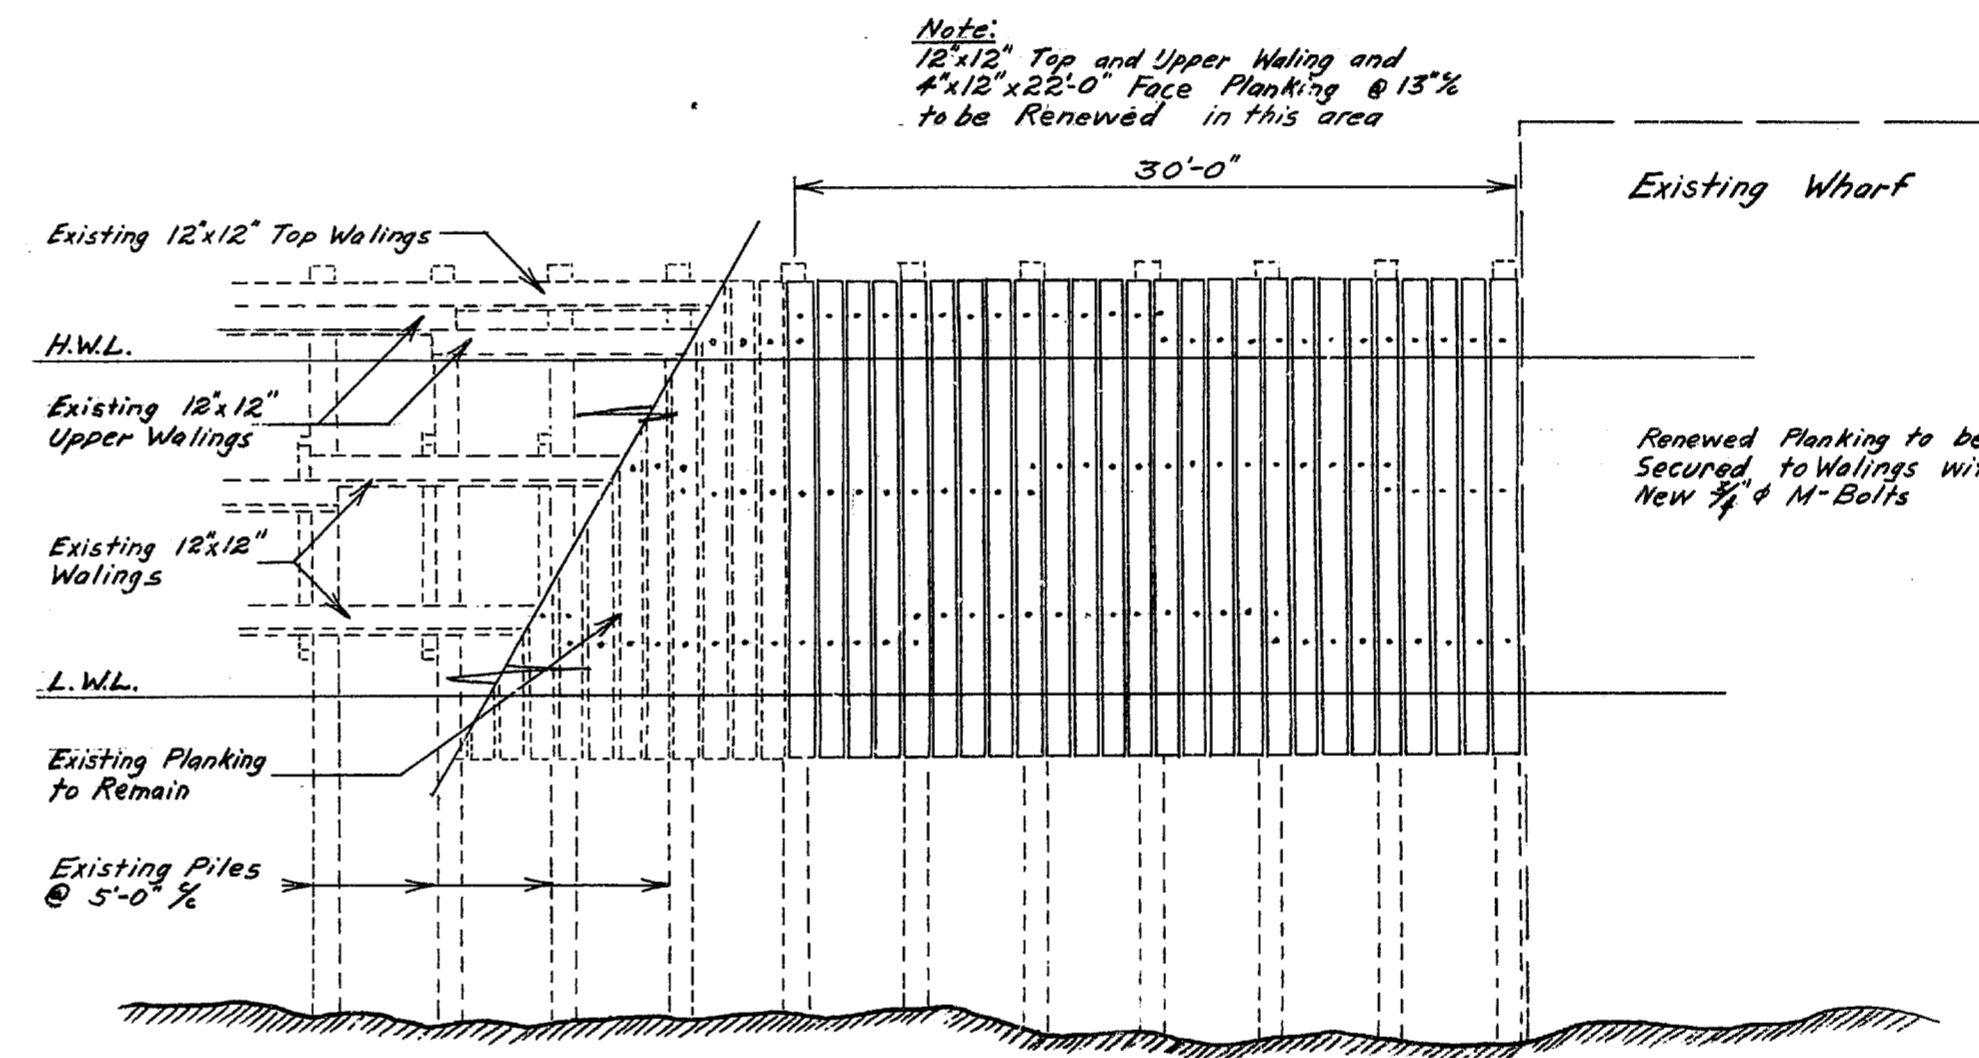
BREAKWATER ELEVATION Scale: 1/8" = 1'-0"
